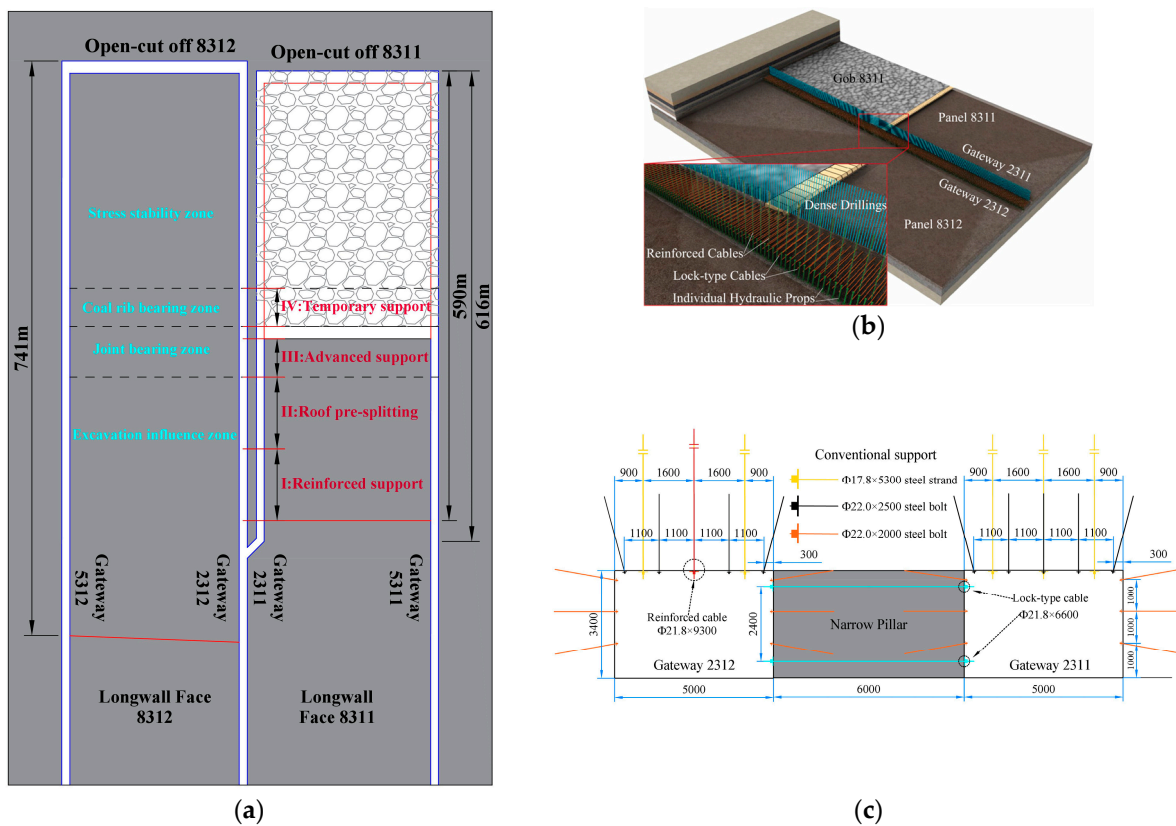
Technical plan for gateway protection with the narrow coal pillar: (a) Partition division in longwall panels; (b) diagram of roof pre-splitting, active and passive support; (c) cross-section diagram of gateways after reinforced support.
